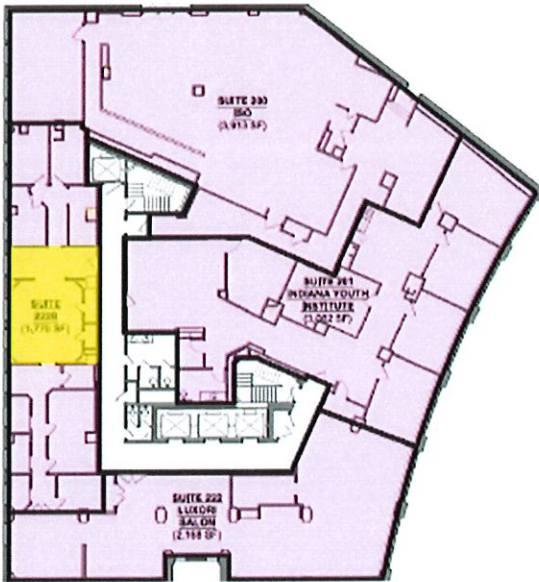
Floor Plan, Barber Shop (Suite 222B) Highlighted in Yellow
